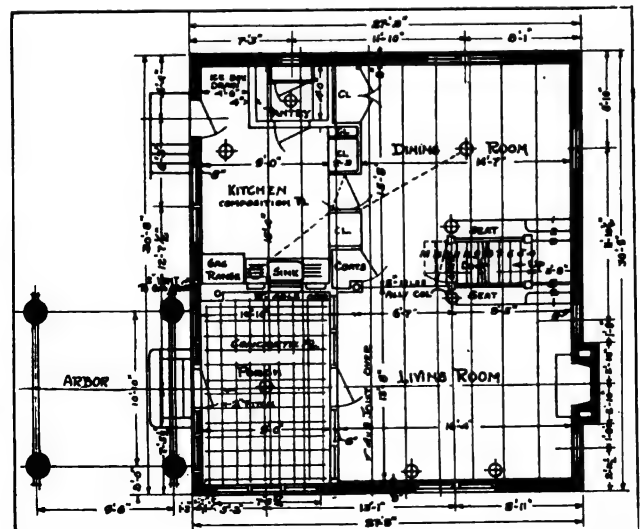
FIRST FLOOR PLAN, THE "EASY-TO-KEEP" HOUSE
